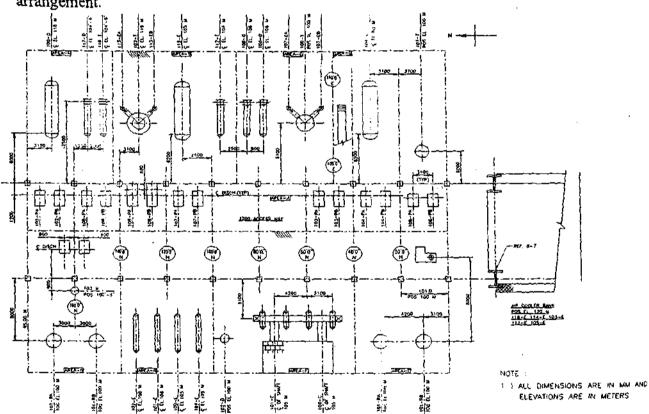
TYPICAL PLOTPLAN OF AN OUTDOOR PETROCHEMICAL PLANT
